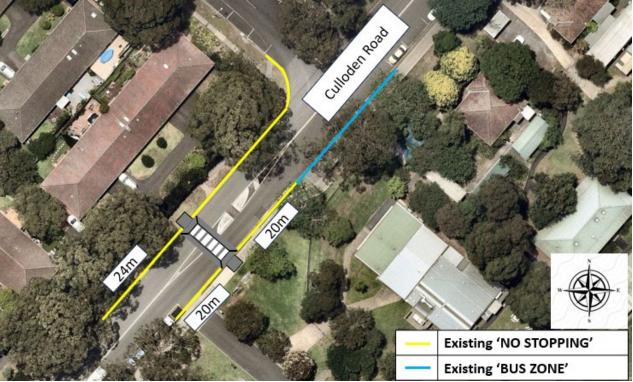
Proposed replacement of pedestrian refuge with raised pedestrian crossing on Culloden Road..
